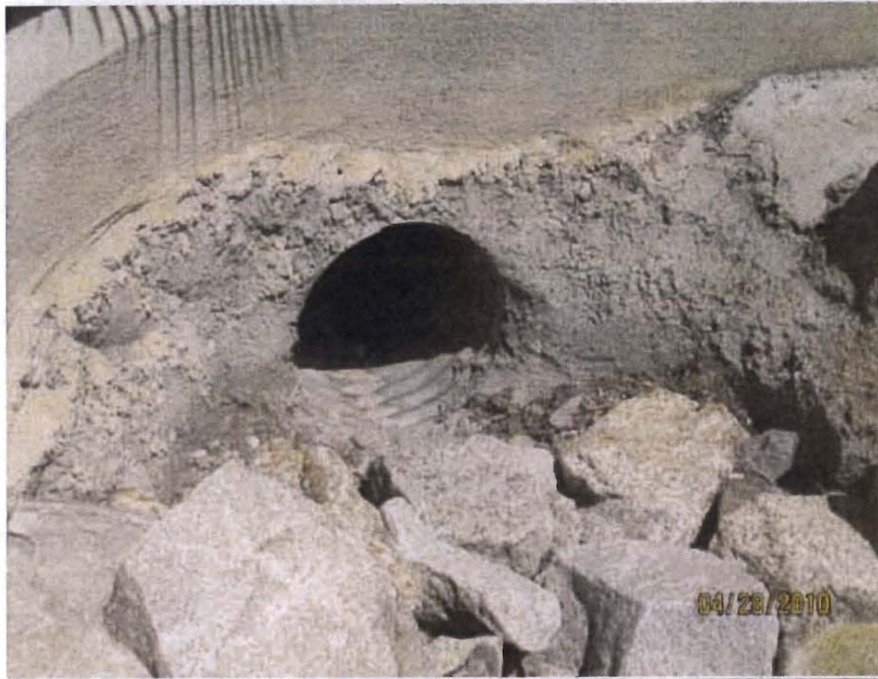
Culvert inlet at Claremont Street which collects Via Vista Grande run off water
